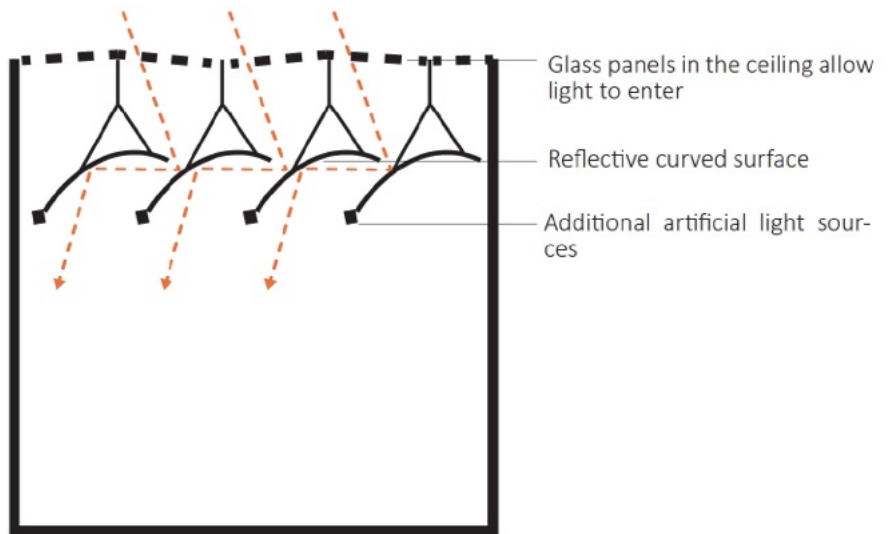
Exposure concept - Menil Art Collection, Renzo Piano, Texas, 1987
